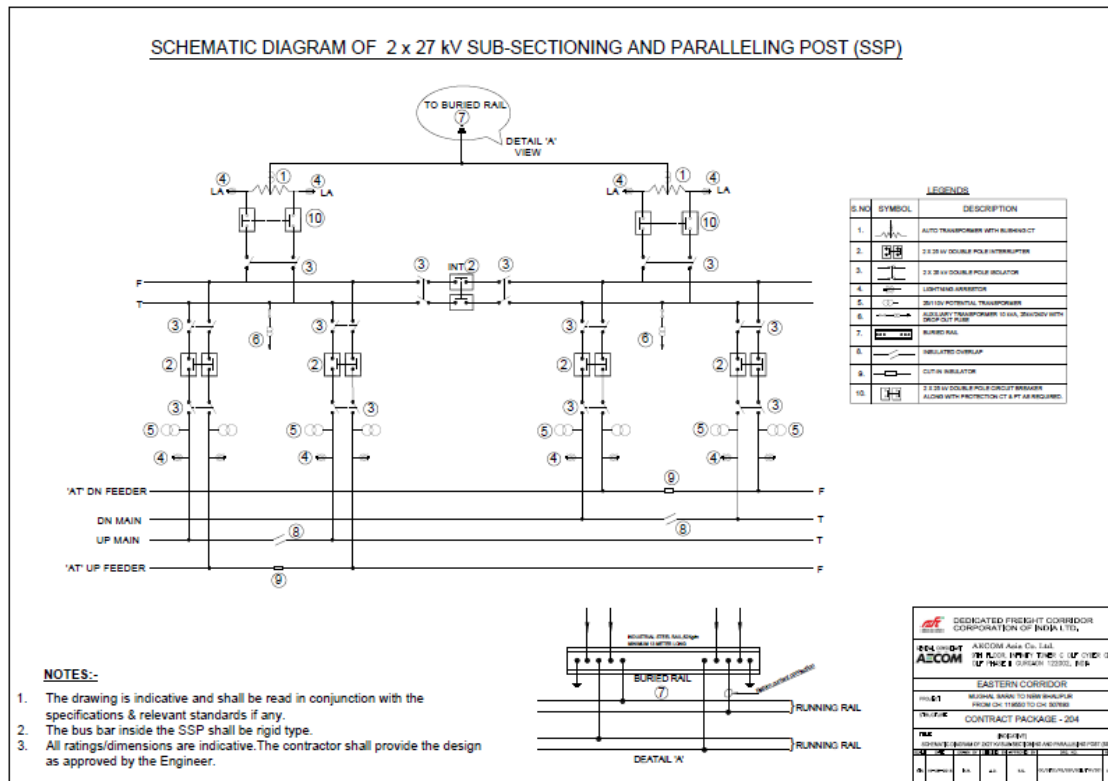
Outdoor Type Sub-Sectioning post (SSP)
